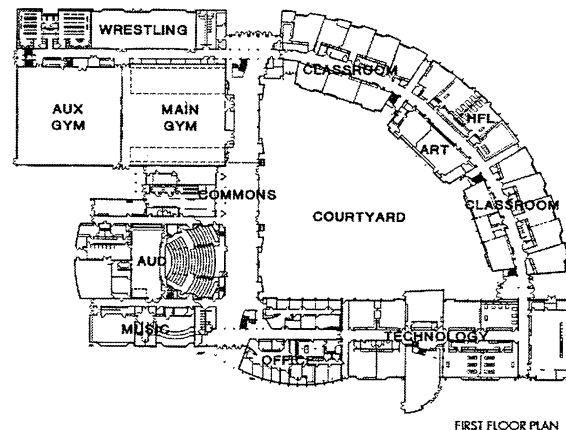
Mead High School, Spokane, WA; Floor Plan
